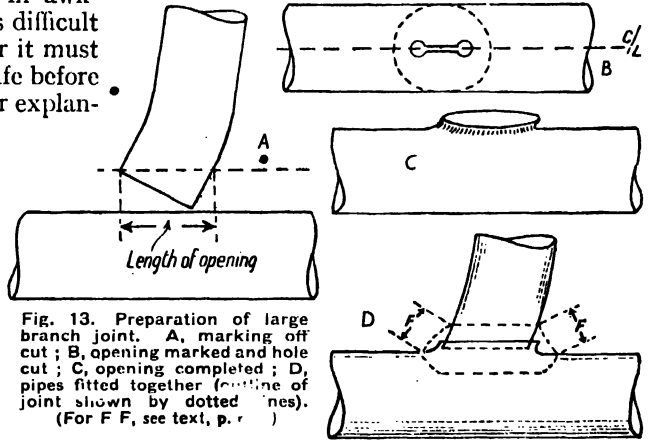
Preparation of large branch joint. A, marking off cut; B, opening marked and hole cut; C, opening completed; D, pipes fitted together (outline of joint shown by dotted lines). (For F F, see text, p. 626.)
